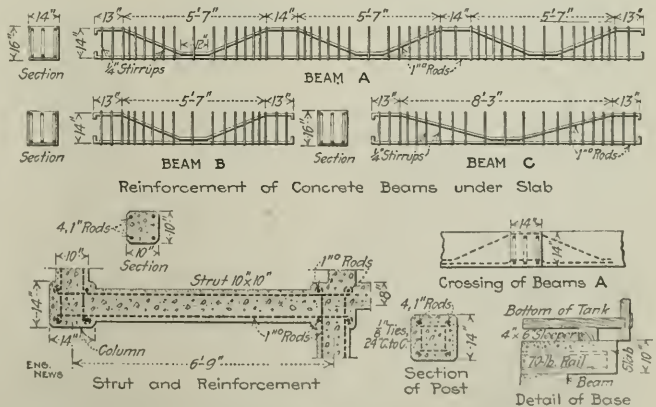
DETAILS OF REINFORCED-CONCRETE TOWER FOR WATER TANK
